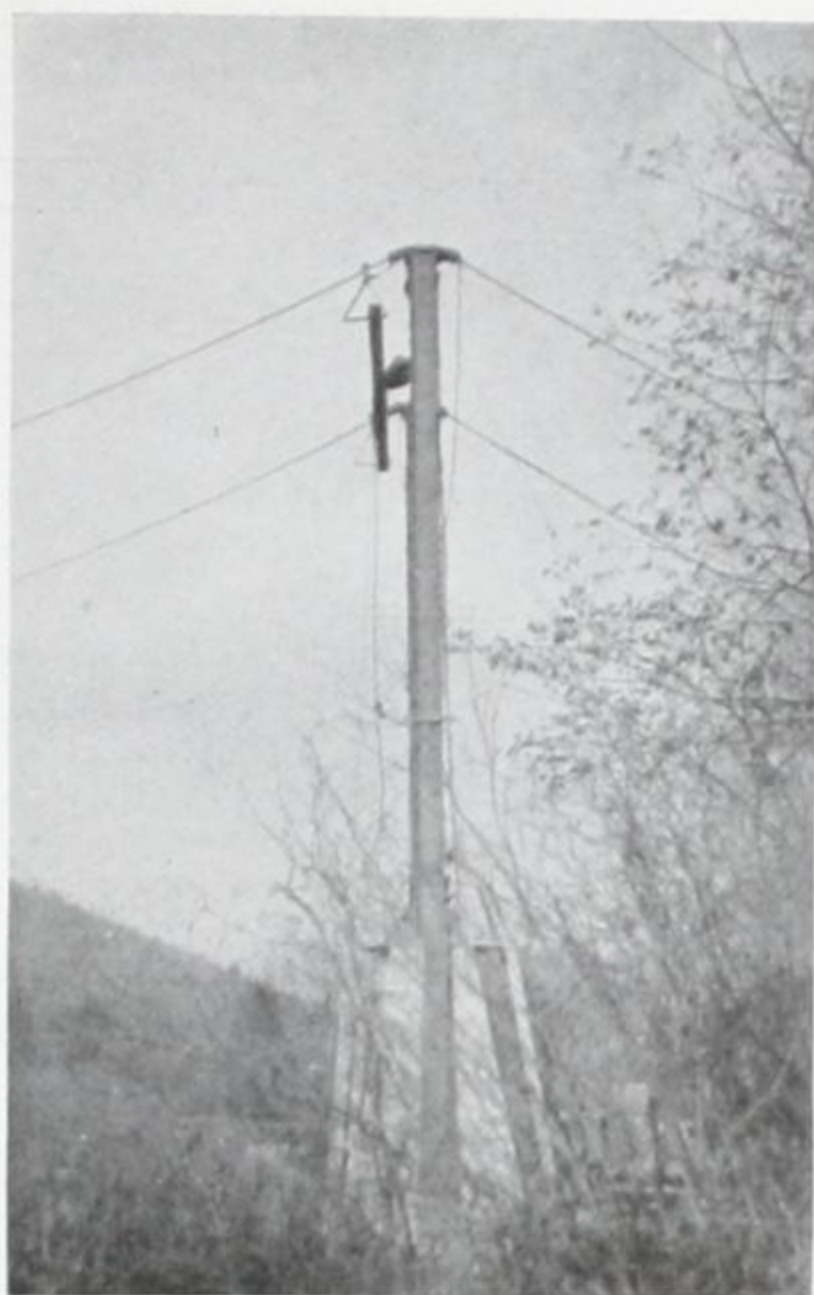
Cables adjusted and clamped at tower saddles. Erection carriage in place and ready for placing cable bands and suspenders
